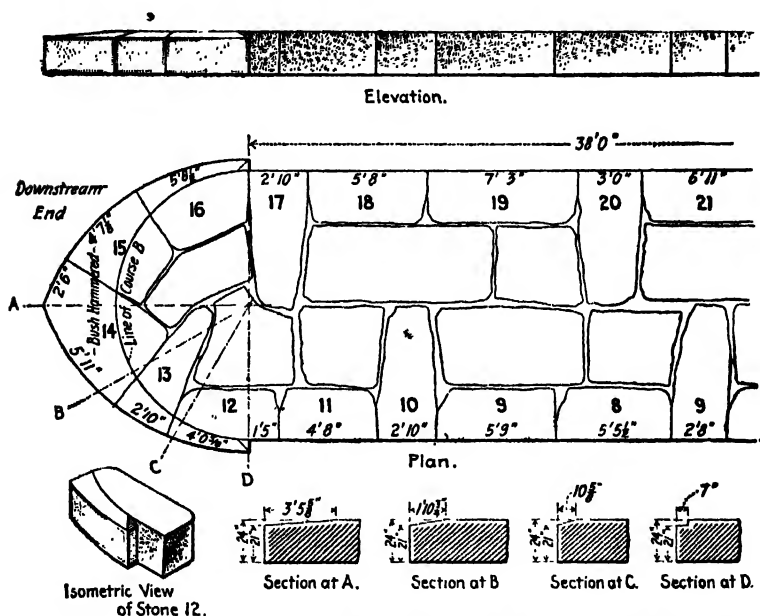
Starling Coping Course for Pier IV, Merchant's Bridge, St. Louis.
